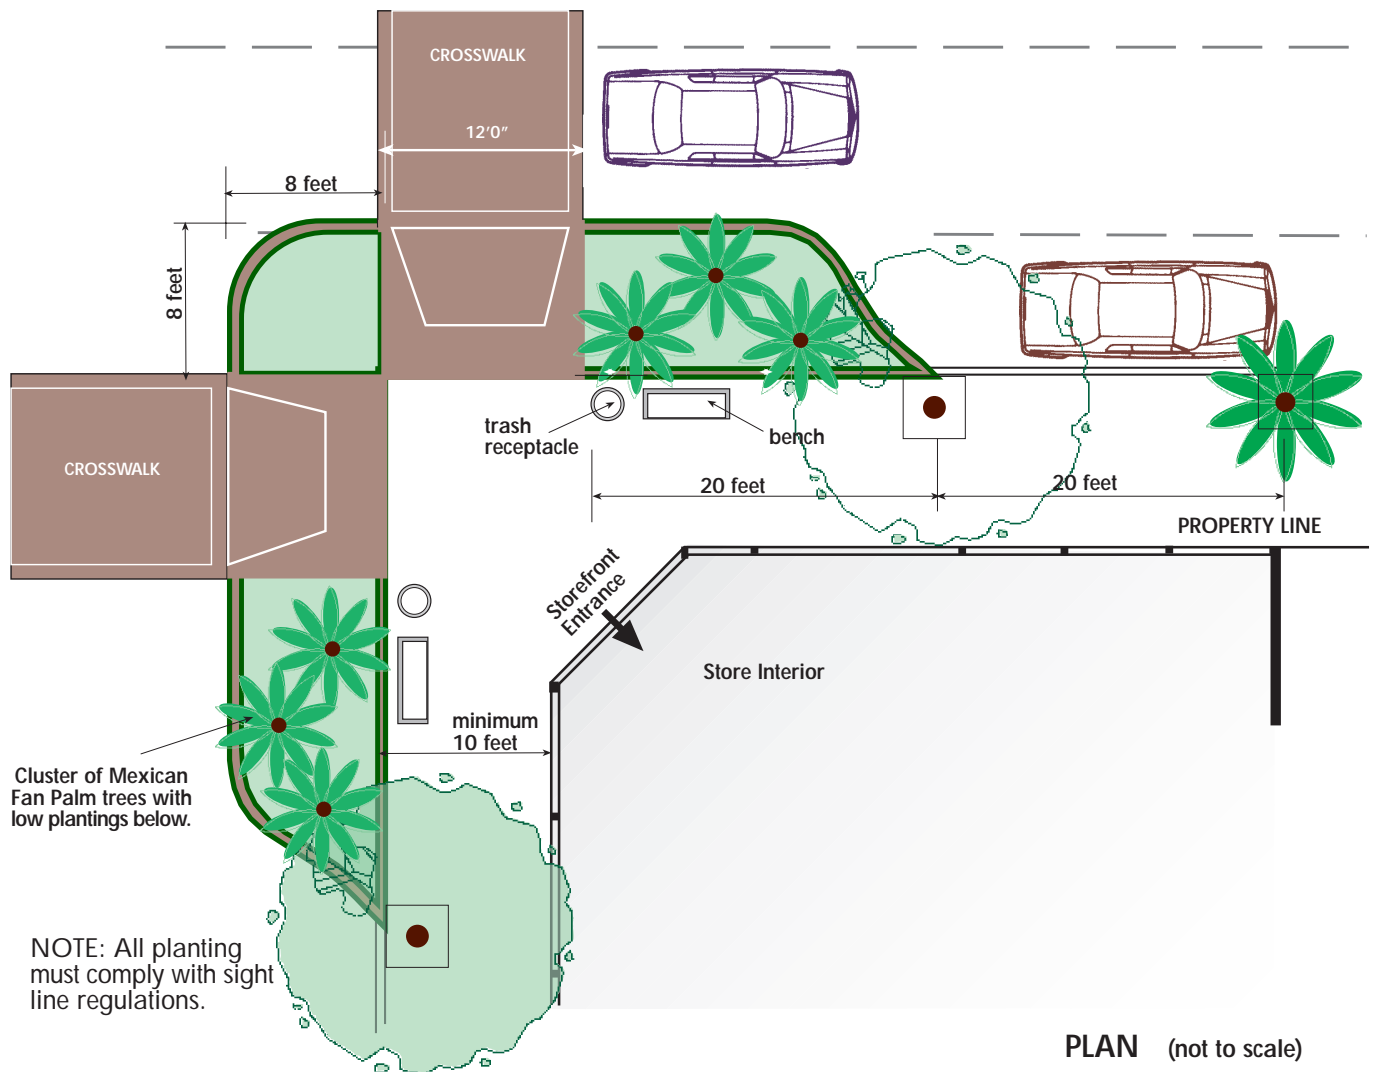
Typical bulb-out layout (plan) for street intersections
